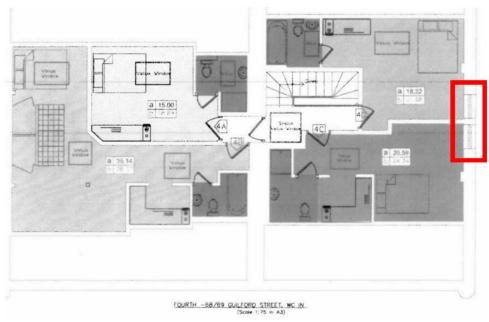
Existing fourth floor floorplan, taken from application 2016/3485/P.
